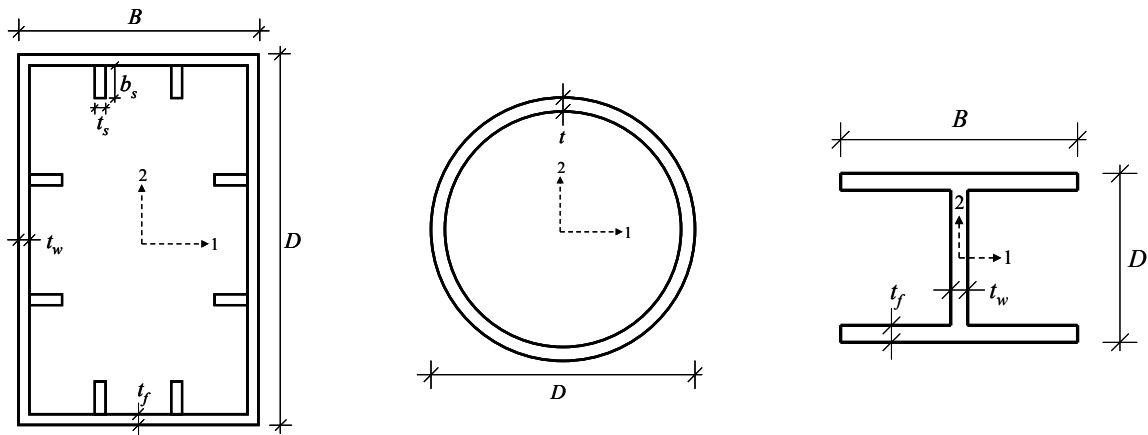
Cross-sections employed in the case study container cranes and their dimensions.
